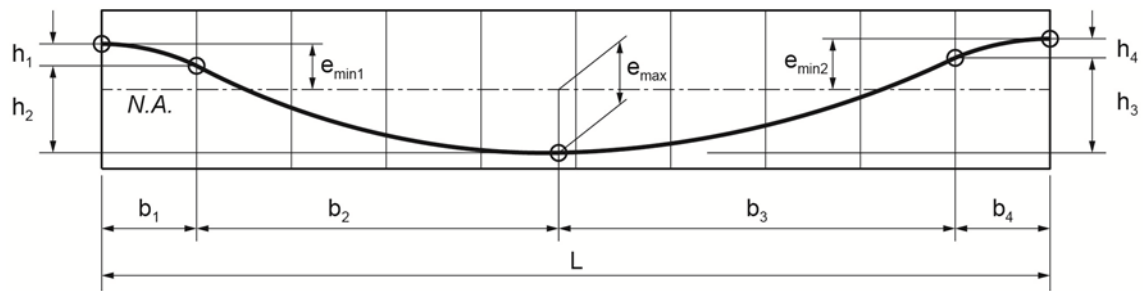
Typical Interior Span Tendon Profile for Continuous Superstructures
